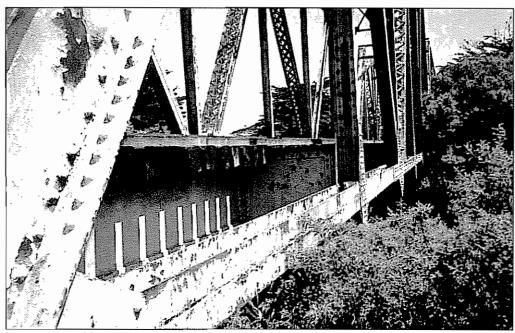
(left) – View shows truss members and floor system components in Panel 5 of Span 4, right side. Note various paint conditions of the bottom chord, diagonal, floorbeam, and stringer.
